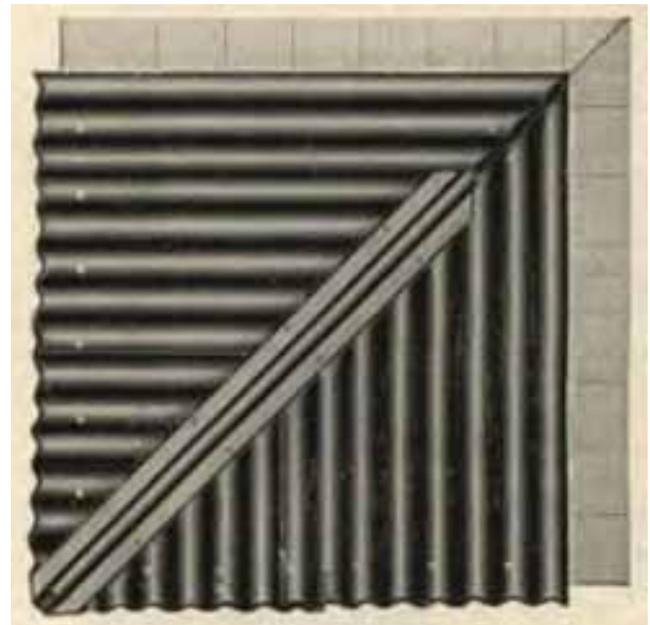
A roof plan view of corrugated metal roofing on a hipped roof with a ridge cap (Milwaukee Corrugating Co. 1920:147).
